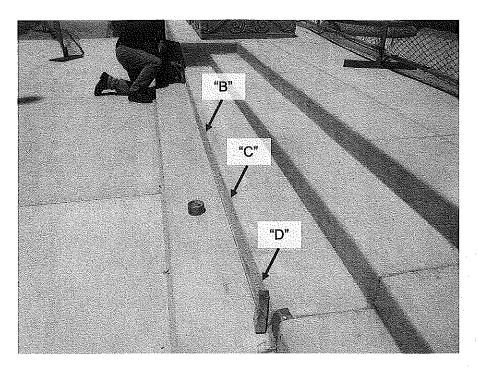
OVERALL PHOTO AT STAIRWAY A, NORTH SECTION
